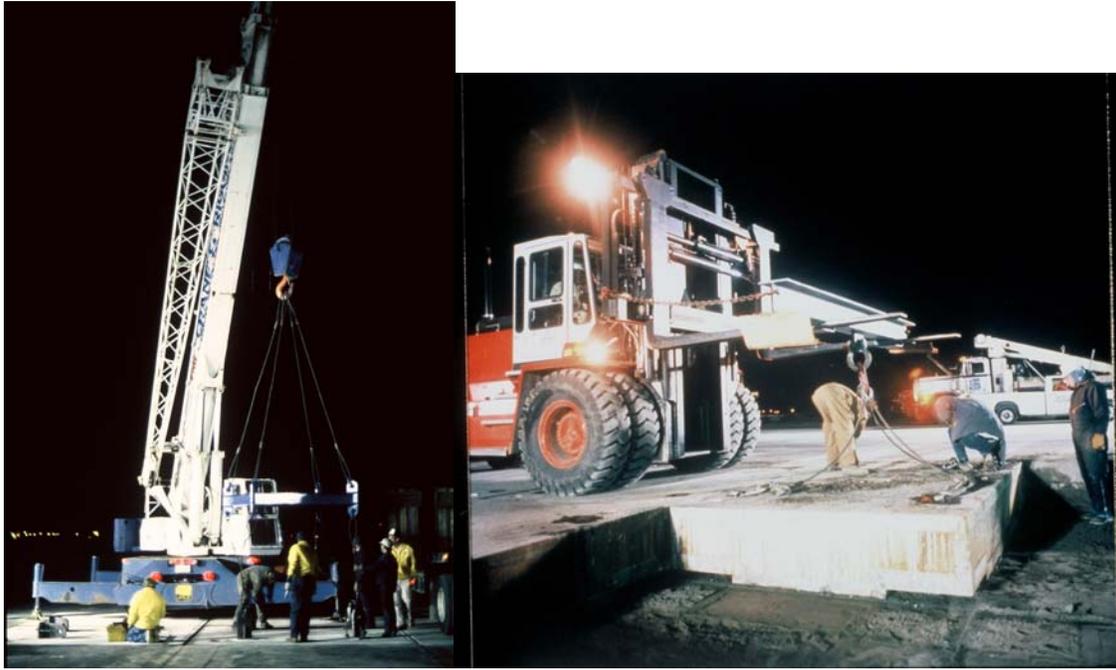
Larger crane used in Charleston (left) and smaller equipment used in Savannah (right) to place temporary pre-cast panels.
